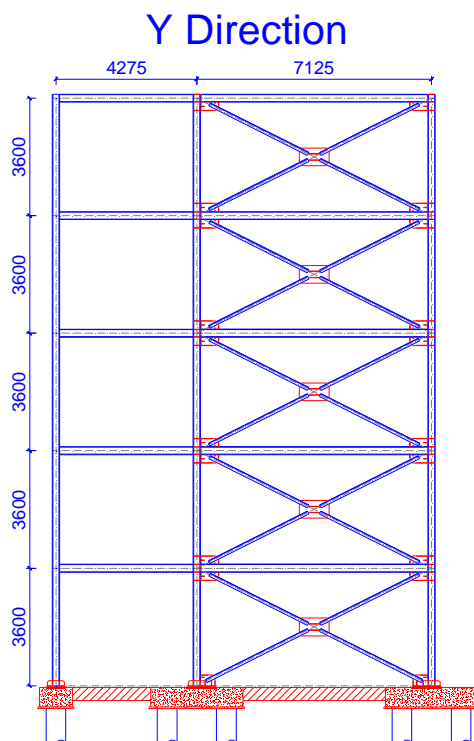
Frame Elevation – Y direction – Asymmetric Configuration (length unit mm)
